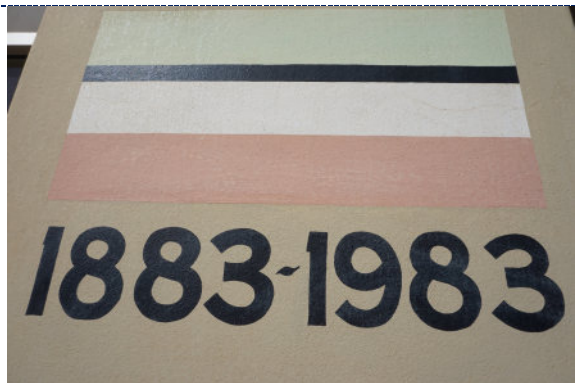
Detail – chalking (UV degradation) and fading of the paint.
